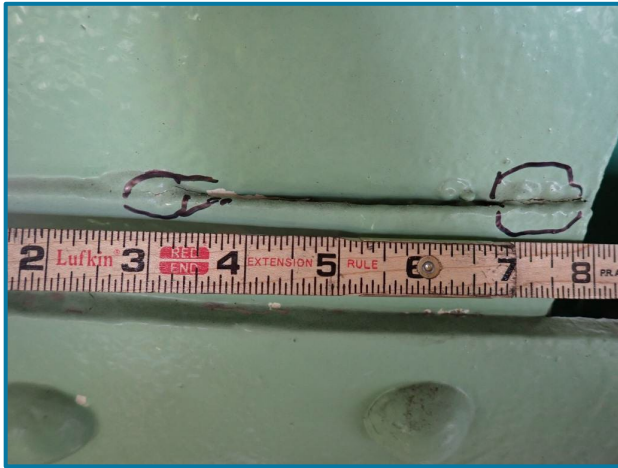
1” crack and broken weld at the fill plate welds to the vertical (U13L13 of the Center Truss, Span 6).
